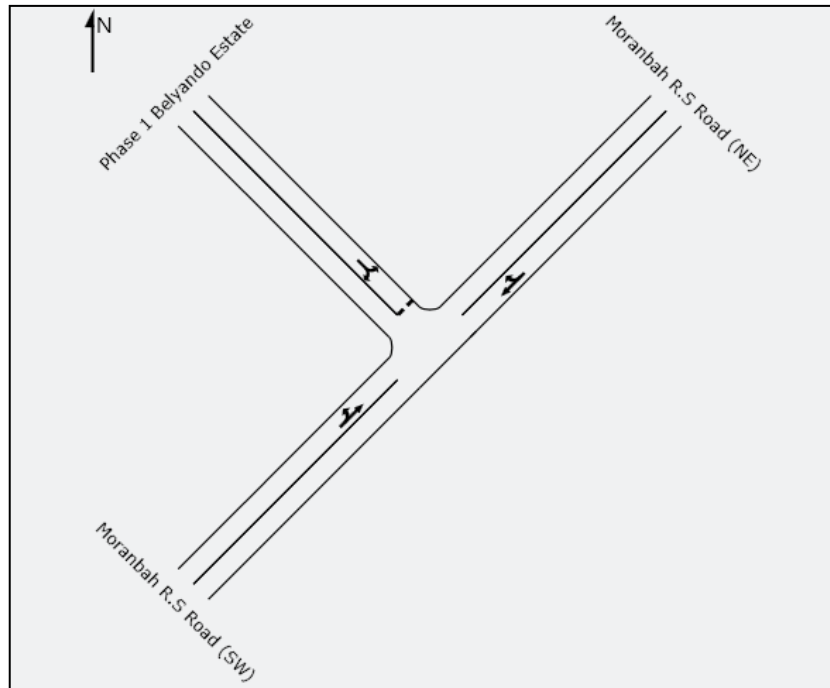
Proposed Intersection Layout – Phase 1 Belyando Estate / Moranbah Railway Station Road
